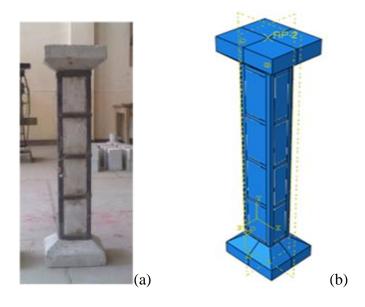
(a) Steel stirrup strengthened column specimens (Ezz-eldeen, 2018) (b) Finite element model of steel strap
